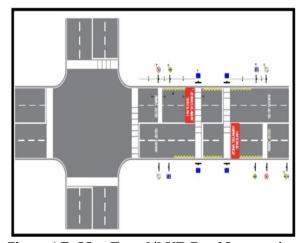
ZoSS at Type 2/2 UD Road Intersection
